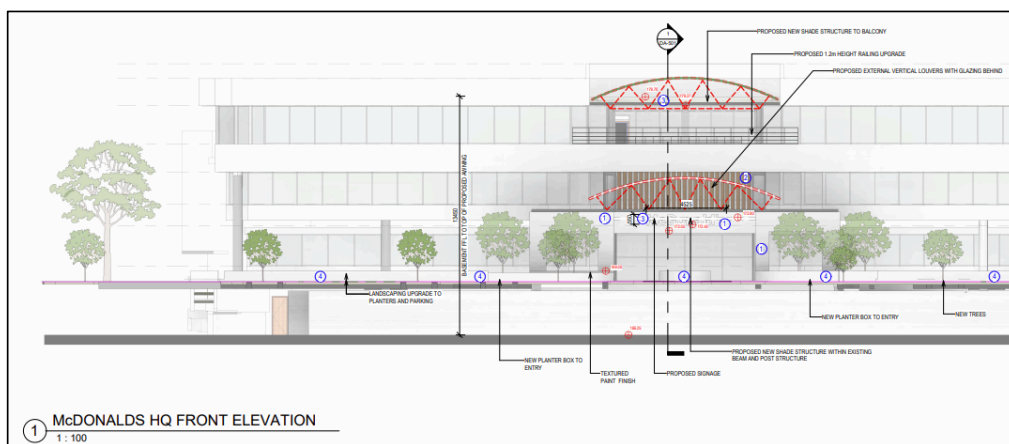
Proposed Northern Elevation (McDonalds HQ) (ID Fitouts and Construction, 2026)
